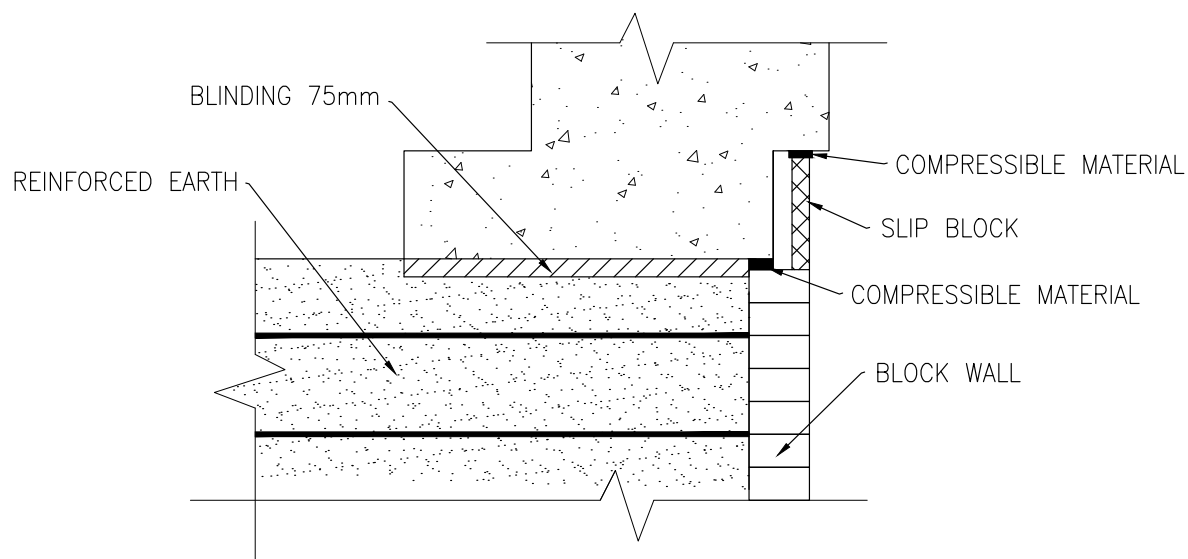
Detail of top of reinforced earth wall with precast kerb
